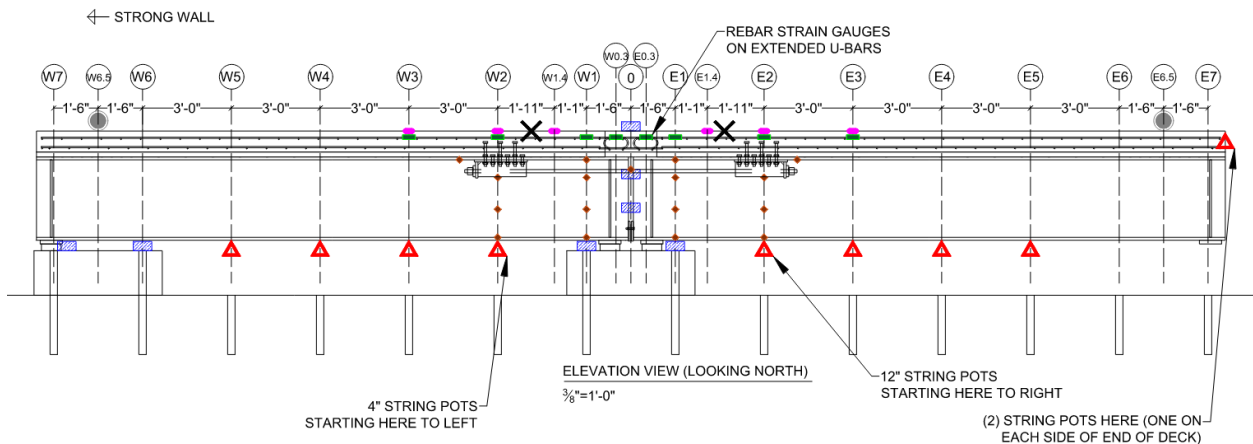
Concept C Instrumentation Plan (Elevation View).
